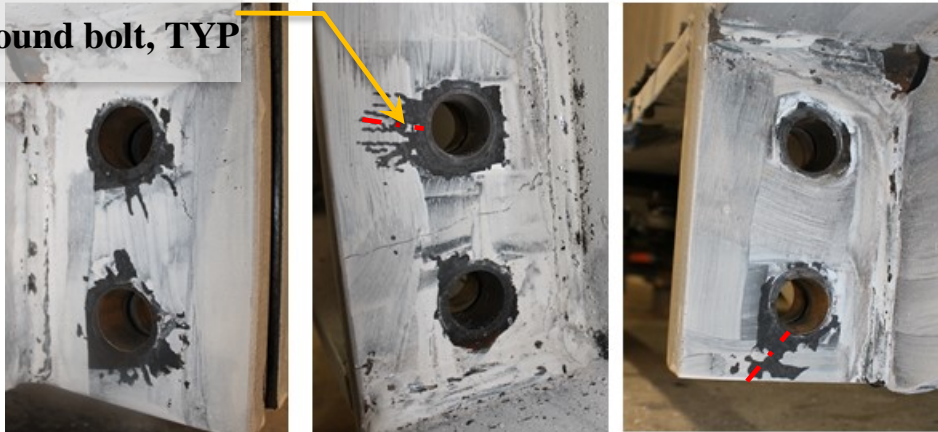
Three views of the specimen 8ES-1.00-1.00-56 and zoomed in views to show local yielding around the bolts, at the end of the test
